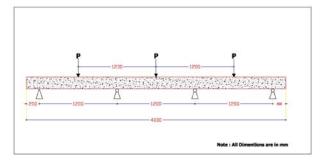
Schematic of specimen B1 without bonded CFRP strip.
